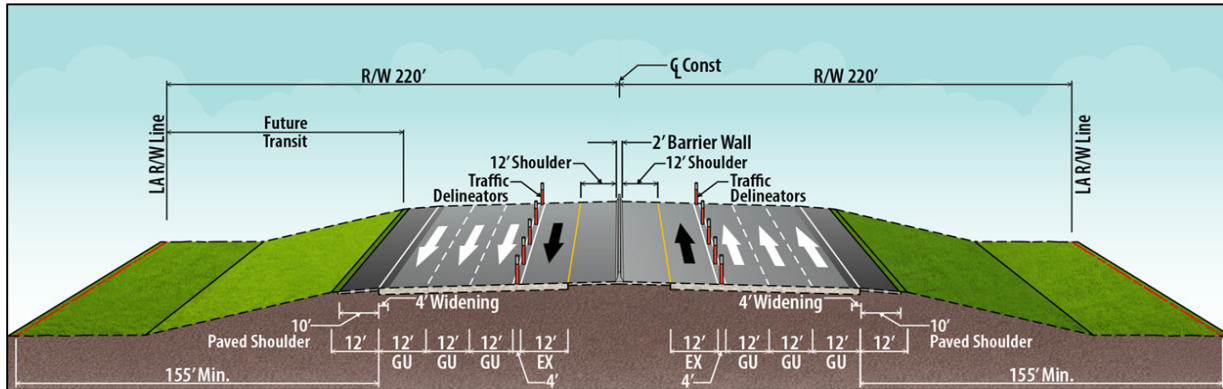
I-275 Mainline Starter Project Build Alternative Typical Section from south of 9th Street North to north of 4th Street North (Segment C-SP3)
